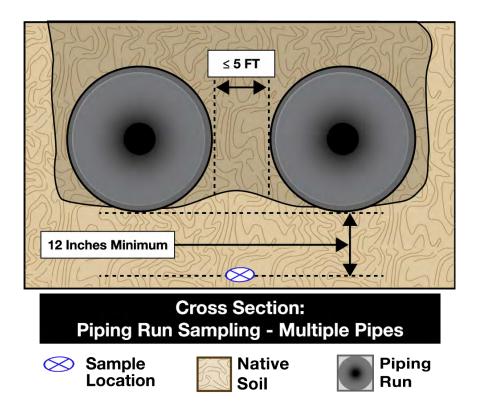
Cross sectional view of sampling locations for a piping run, with multiple pipes in trench.
